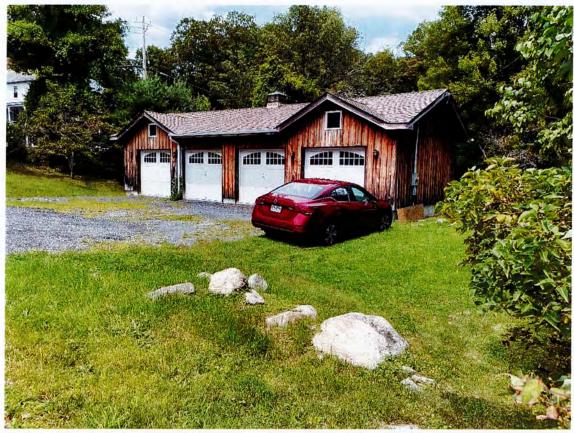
Structure 2b, 721 Peekskill Hollow Road, looking north. Built c.2005, this is a one-story, four-bay, side-gabled garage. Resting on a concrete slab, it is sheathed with vertical wood boards and it has an asphalt shingle roof. The structure is not eligible for inclusion in the National Register of Historic Places due to insufficient age.
